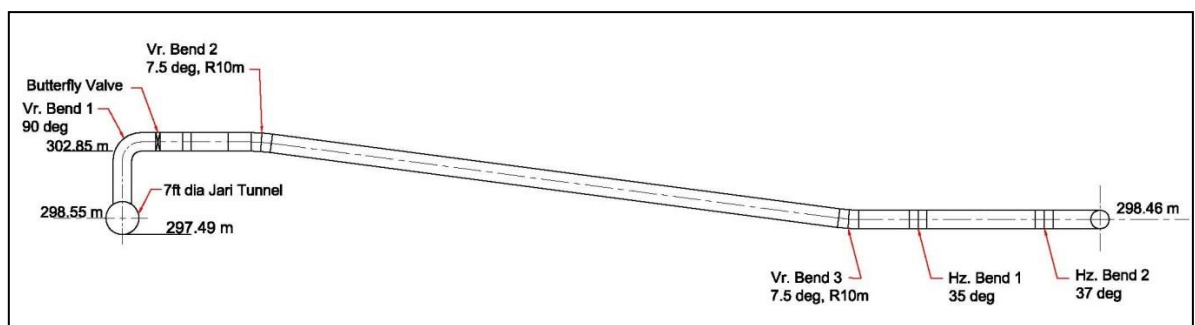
Longitudinal Section of Proposed Penstock for 3.5 MW Powerhouse
